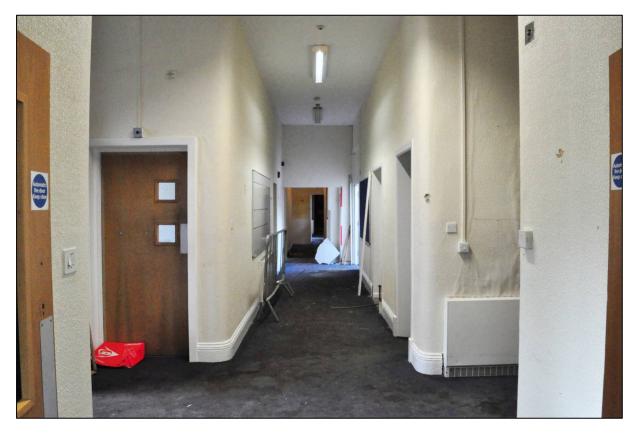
Entrance Block, main corridor G4, looking W (photo 1/2839).
